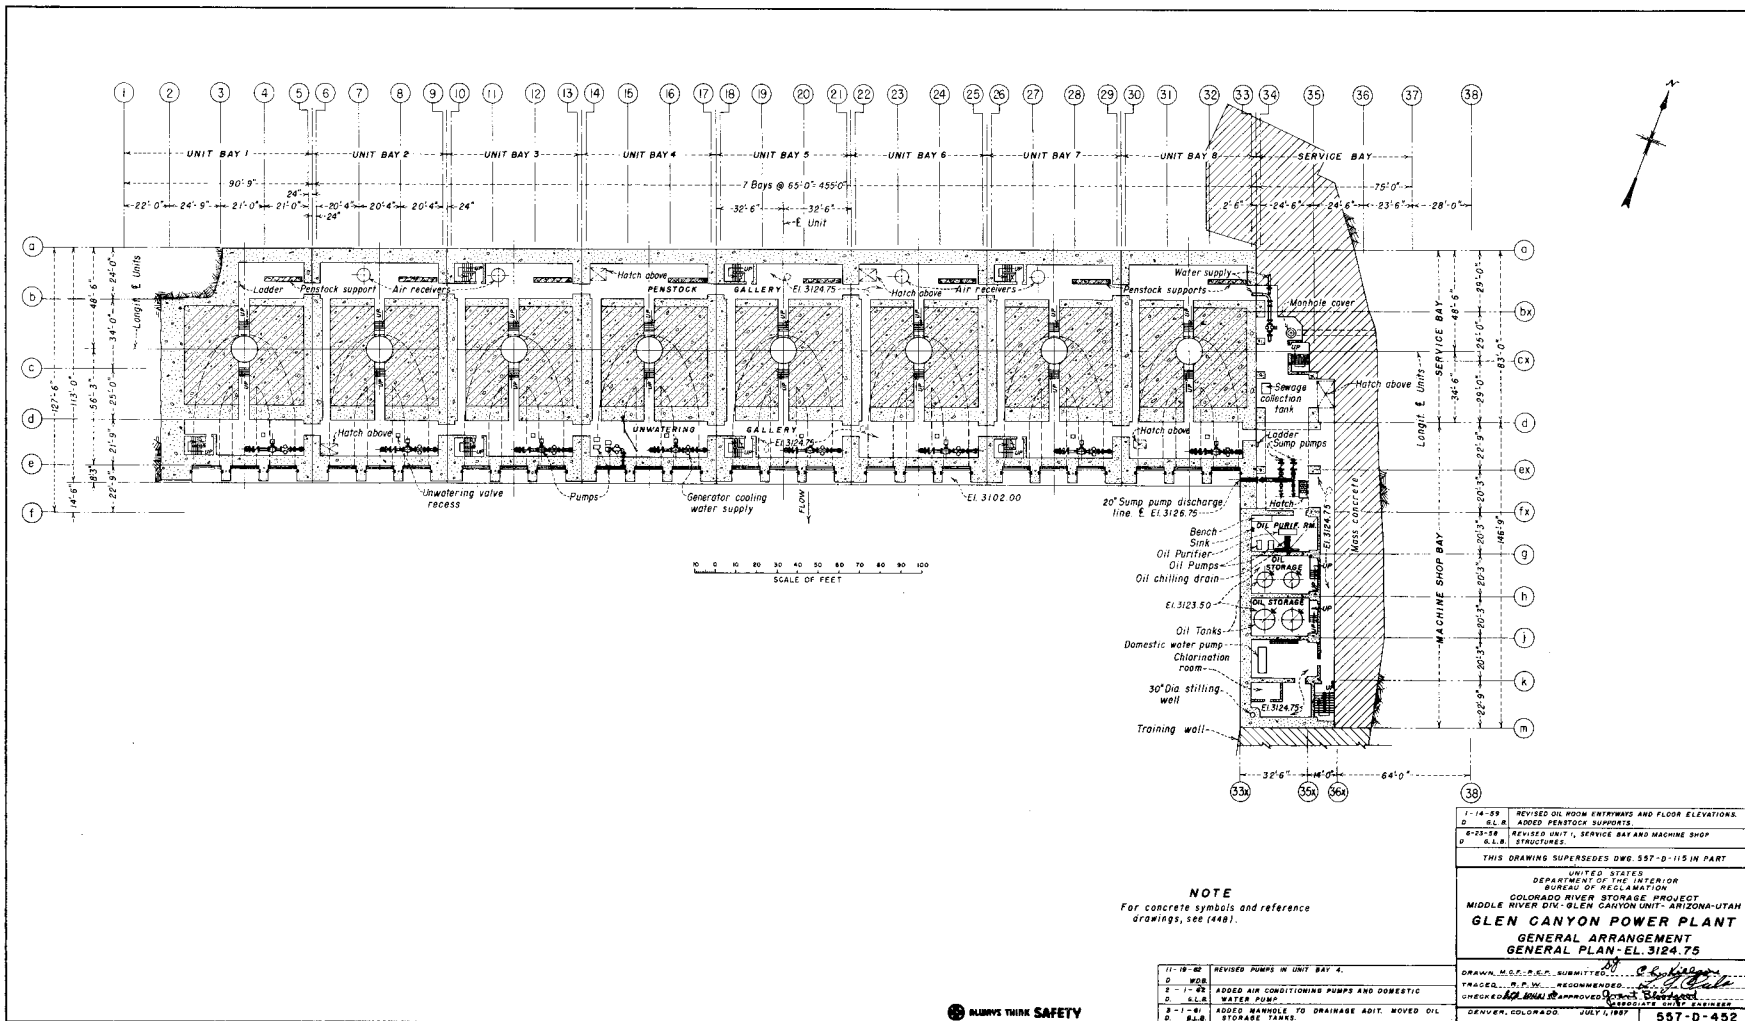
Powerplant general arrangement—Plan, elevation 3124.75.
